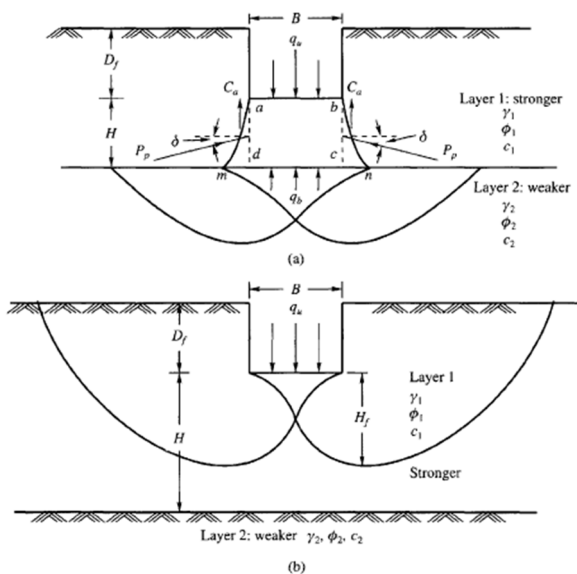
Failure of soil below strip footing under vertical load on strong layer overlying weak deposit (after Meyerhof and Hanna, 1978)
